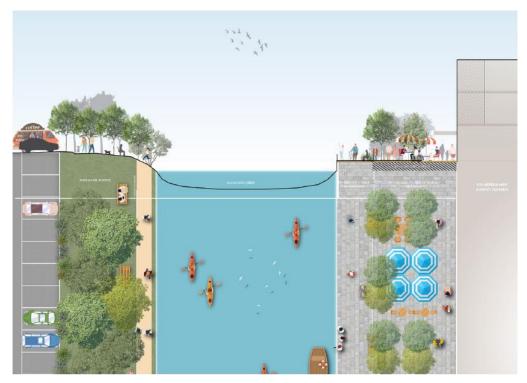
Example plans and cross sections showing how Kananook Creek Promenade could be extended
